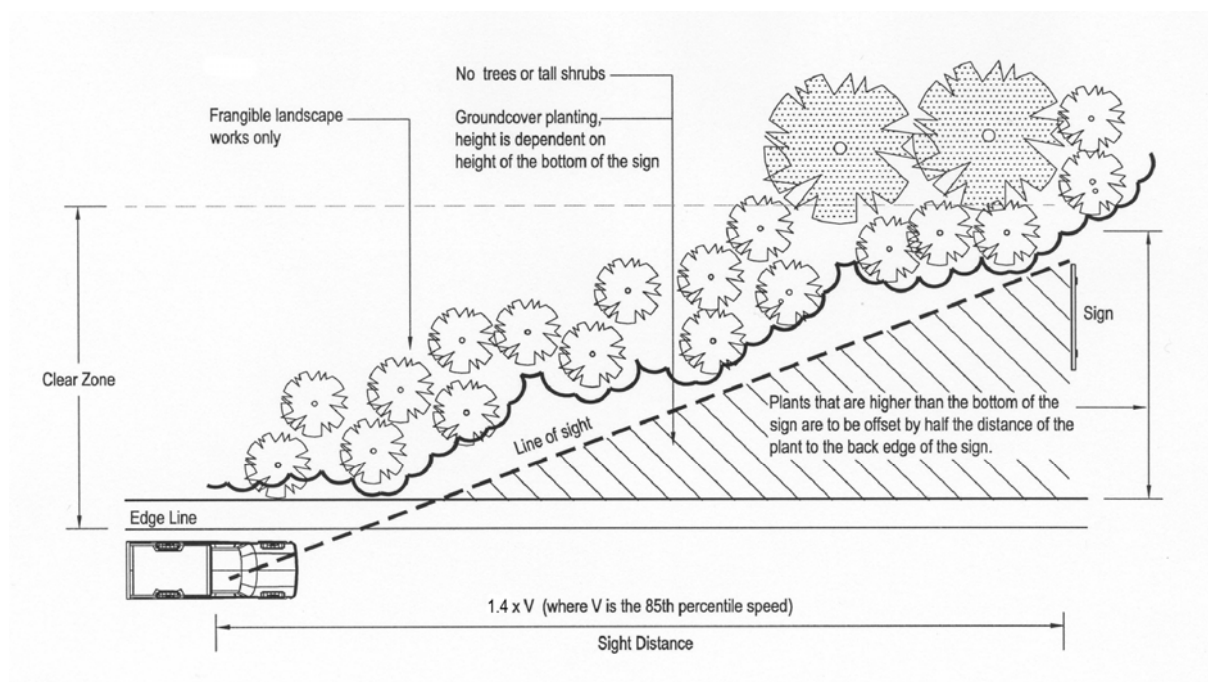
Restrictions on planting to allow sight distance to signage – Plan
